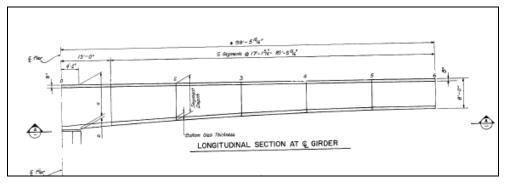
Variation in Depth for Cross-Sections along a Typical Span.
